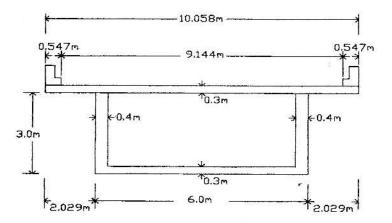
Simply Supported Box-Girder Bridge (Example 2)
